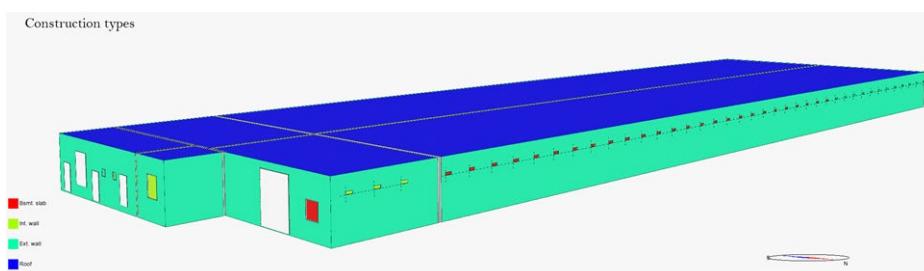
Modelling of the poultry house building structures (Image: IDA ICE)
